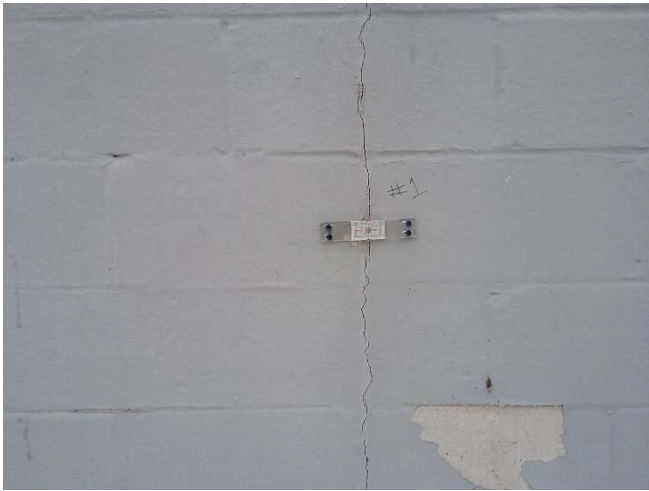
Crack gauge 1 position on a vertical crack on the north exterior wall.
